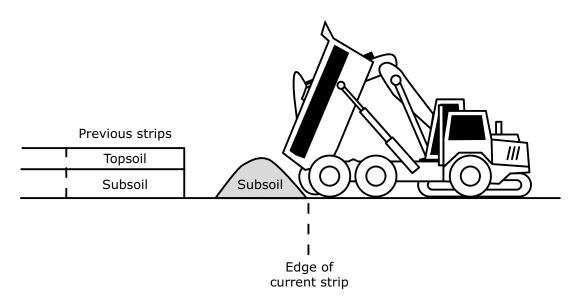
Soil replacement with excavators - dump trucks: Subsoil layer.
